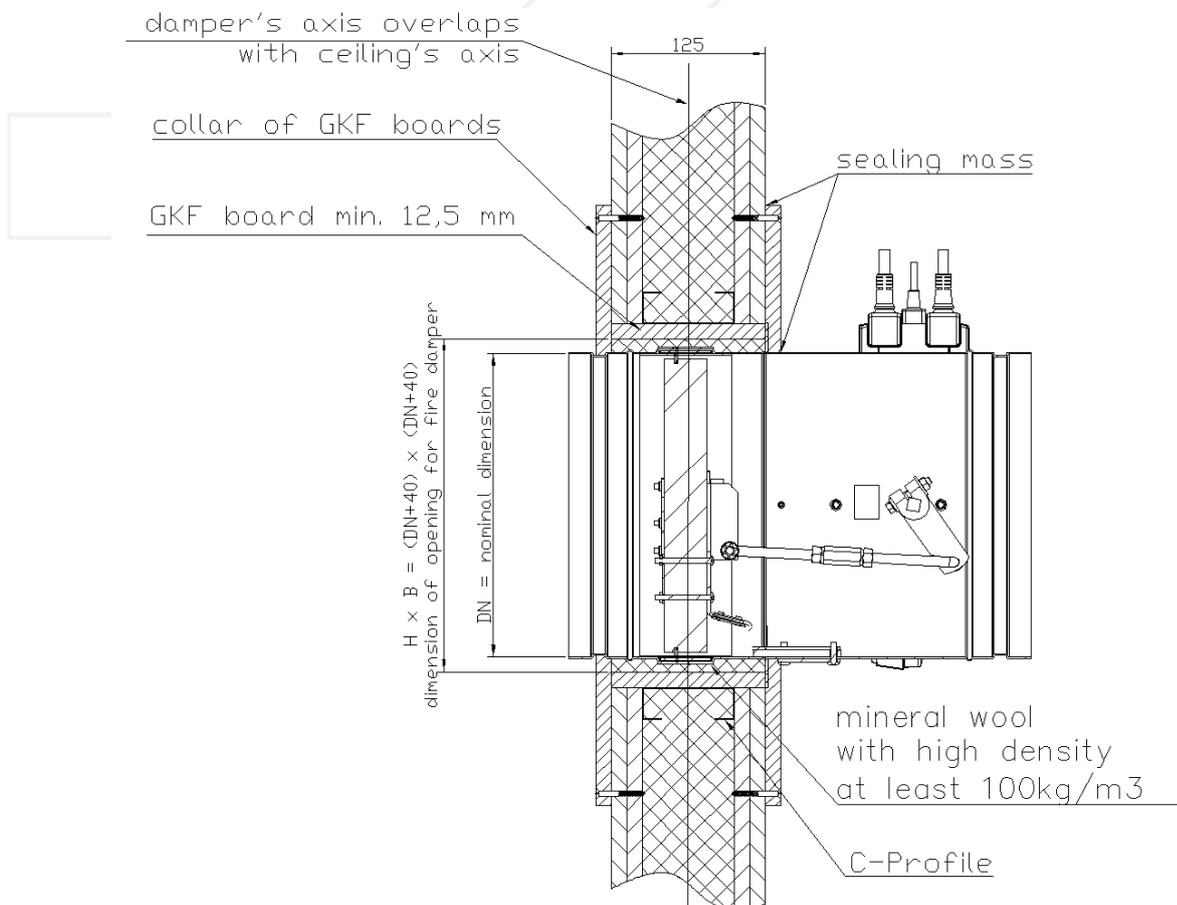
Installation method of fire dampers KTS-O in flexible wall with 125 [mm] thickness
